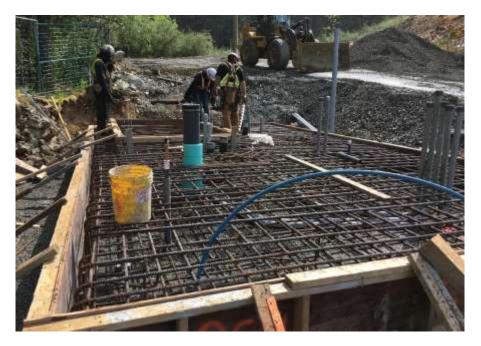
Residual Solids Pump Stations – Pump Station 3 Installing formwork and rebar for odour control unit slab.
